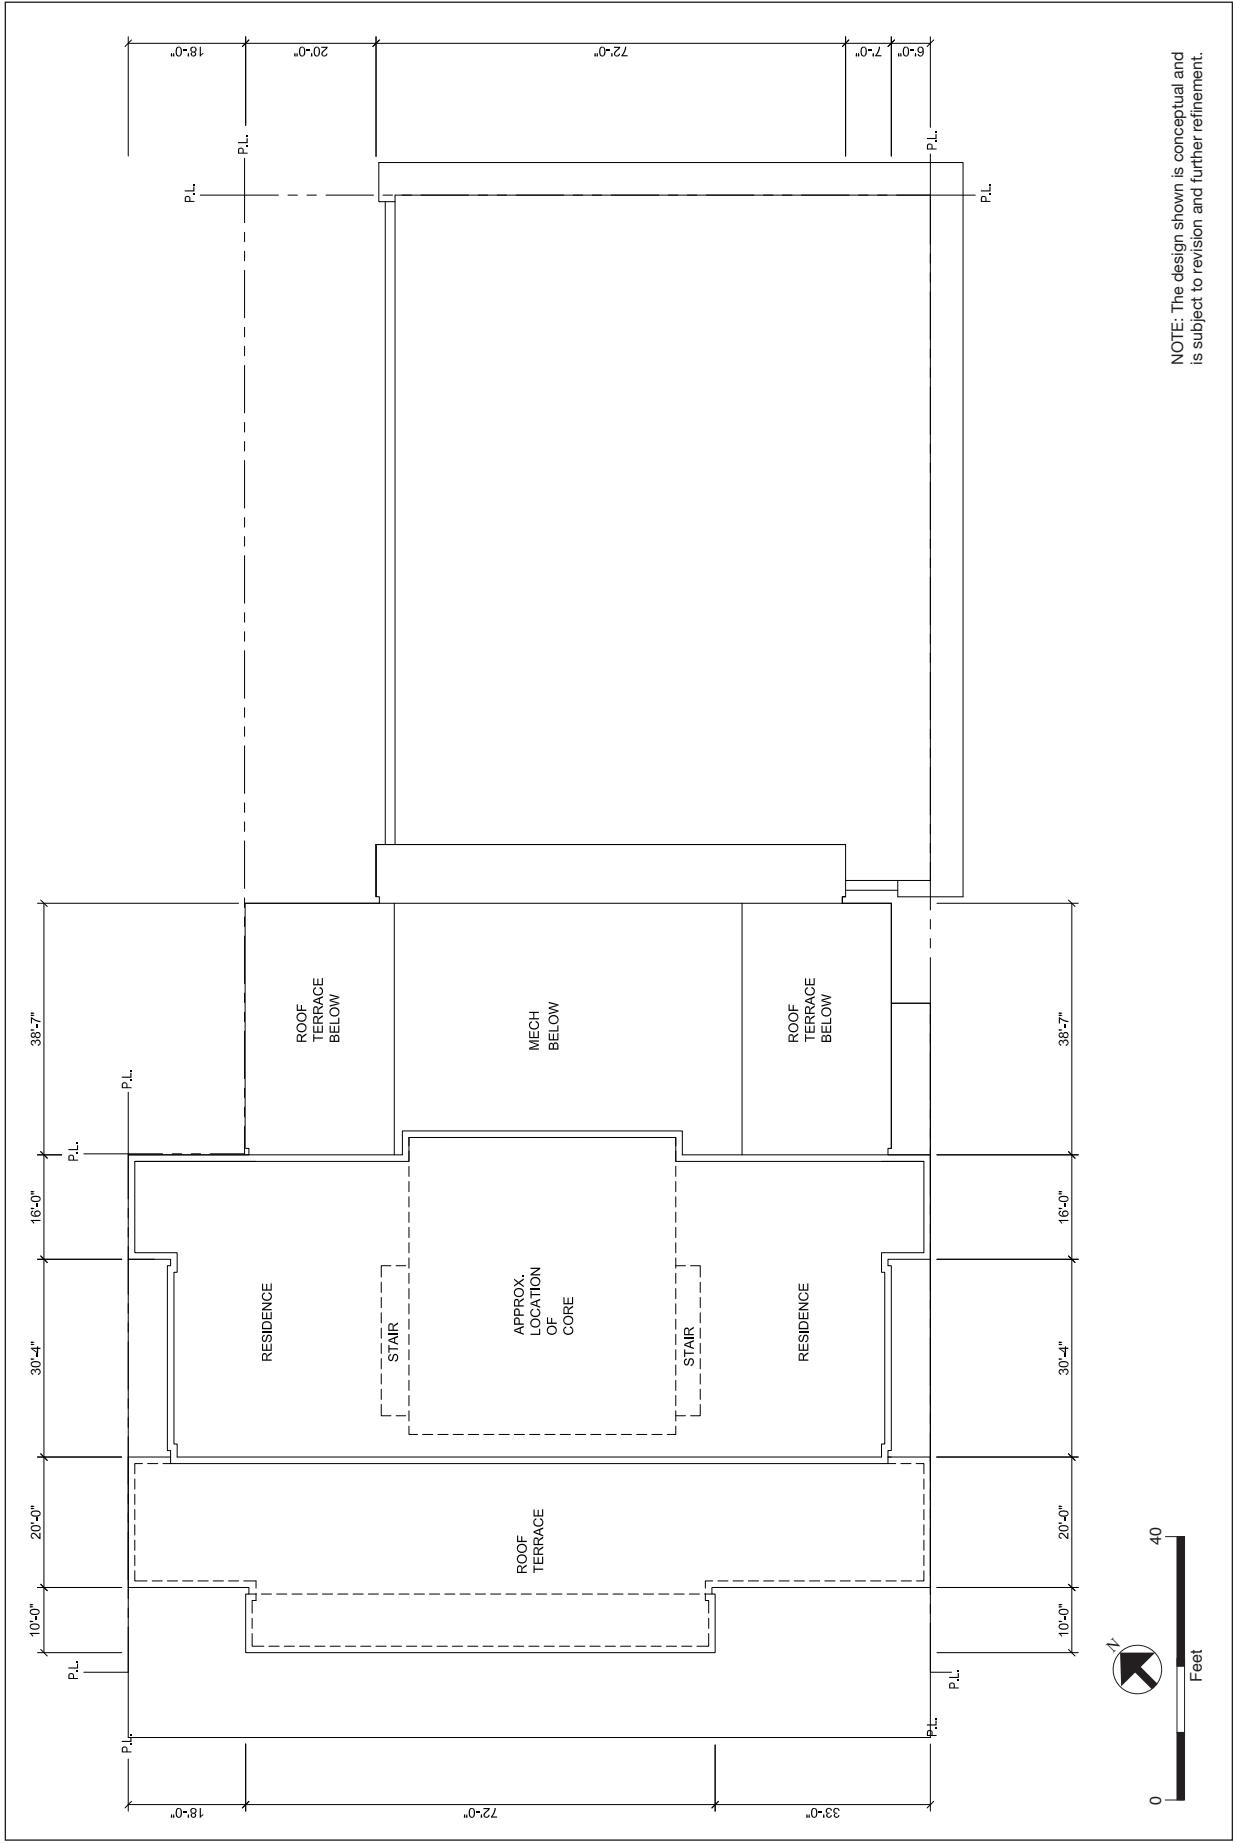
CONCEPTUAL FLOOR FOR FLOORS 44 AND 45 - TOWER
